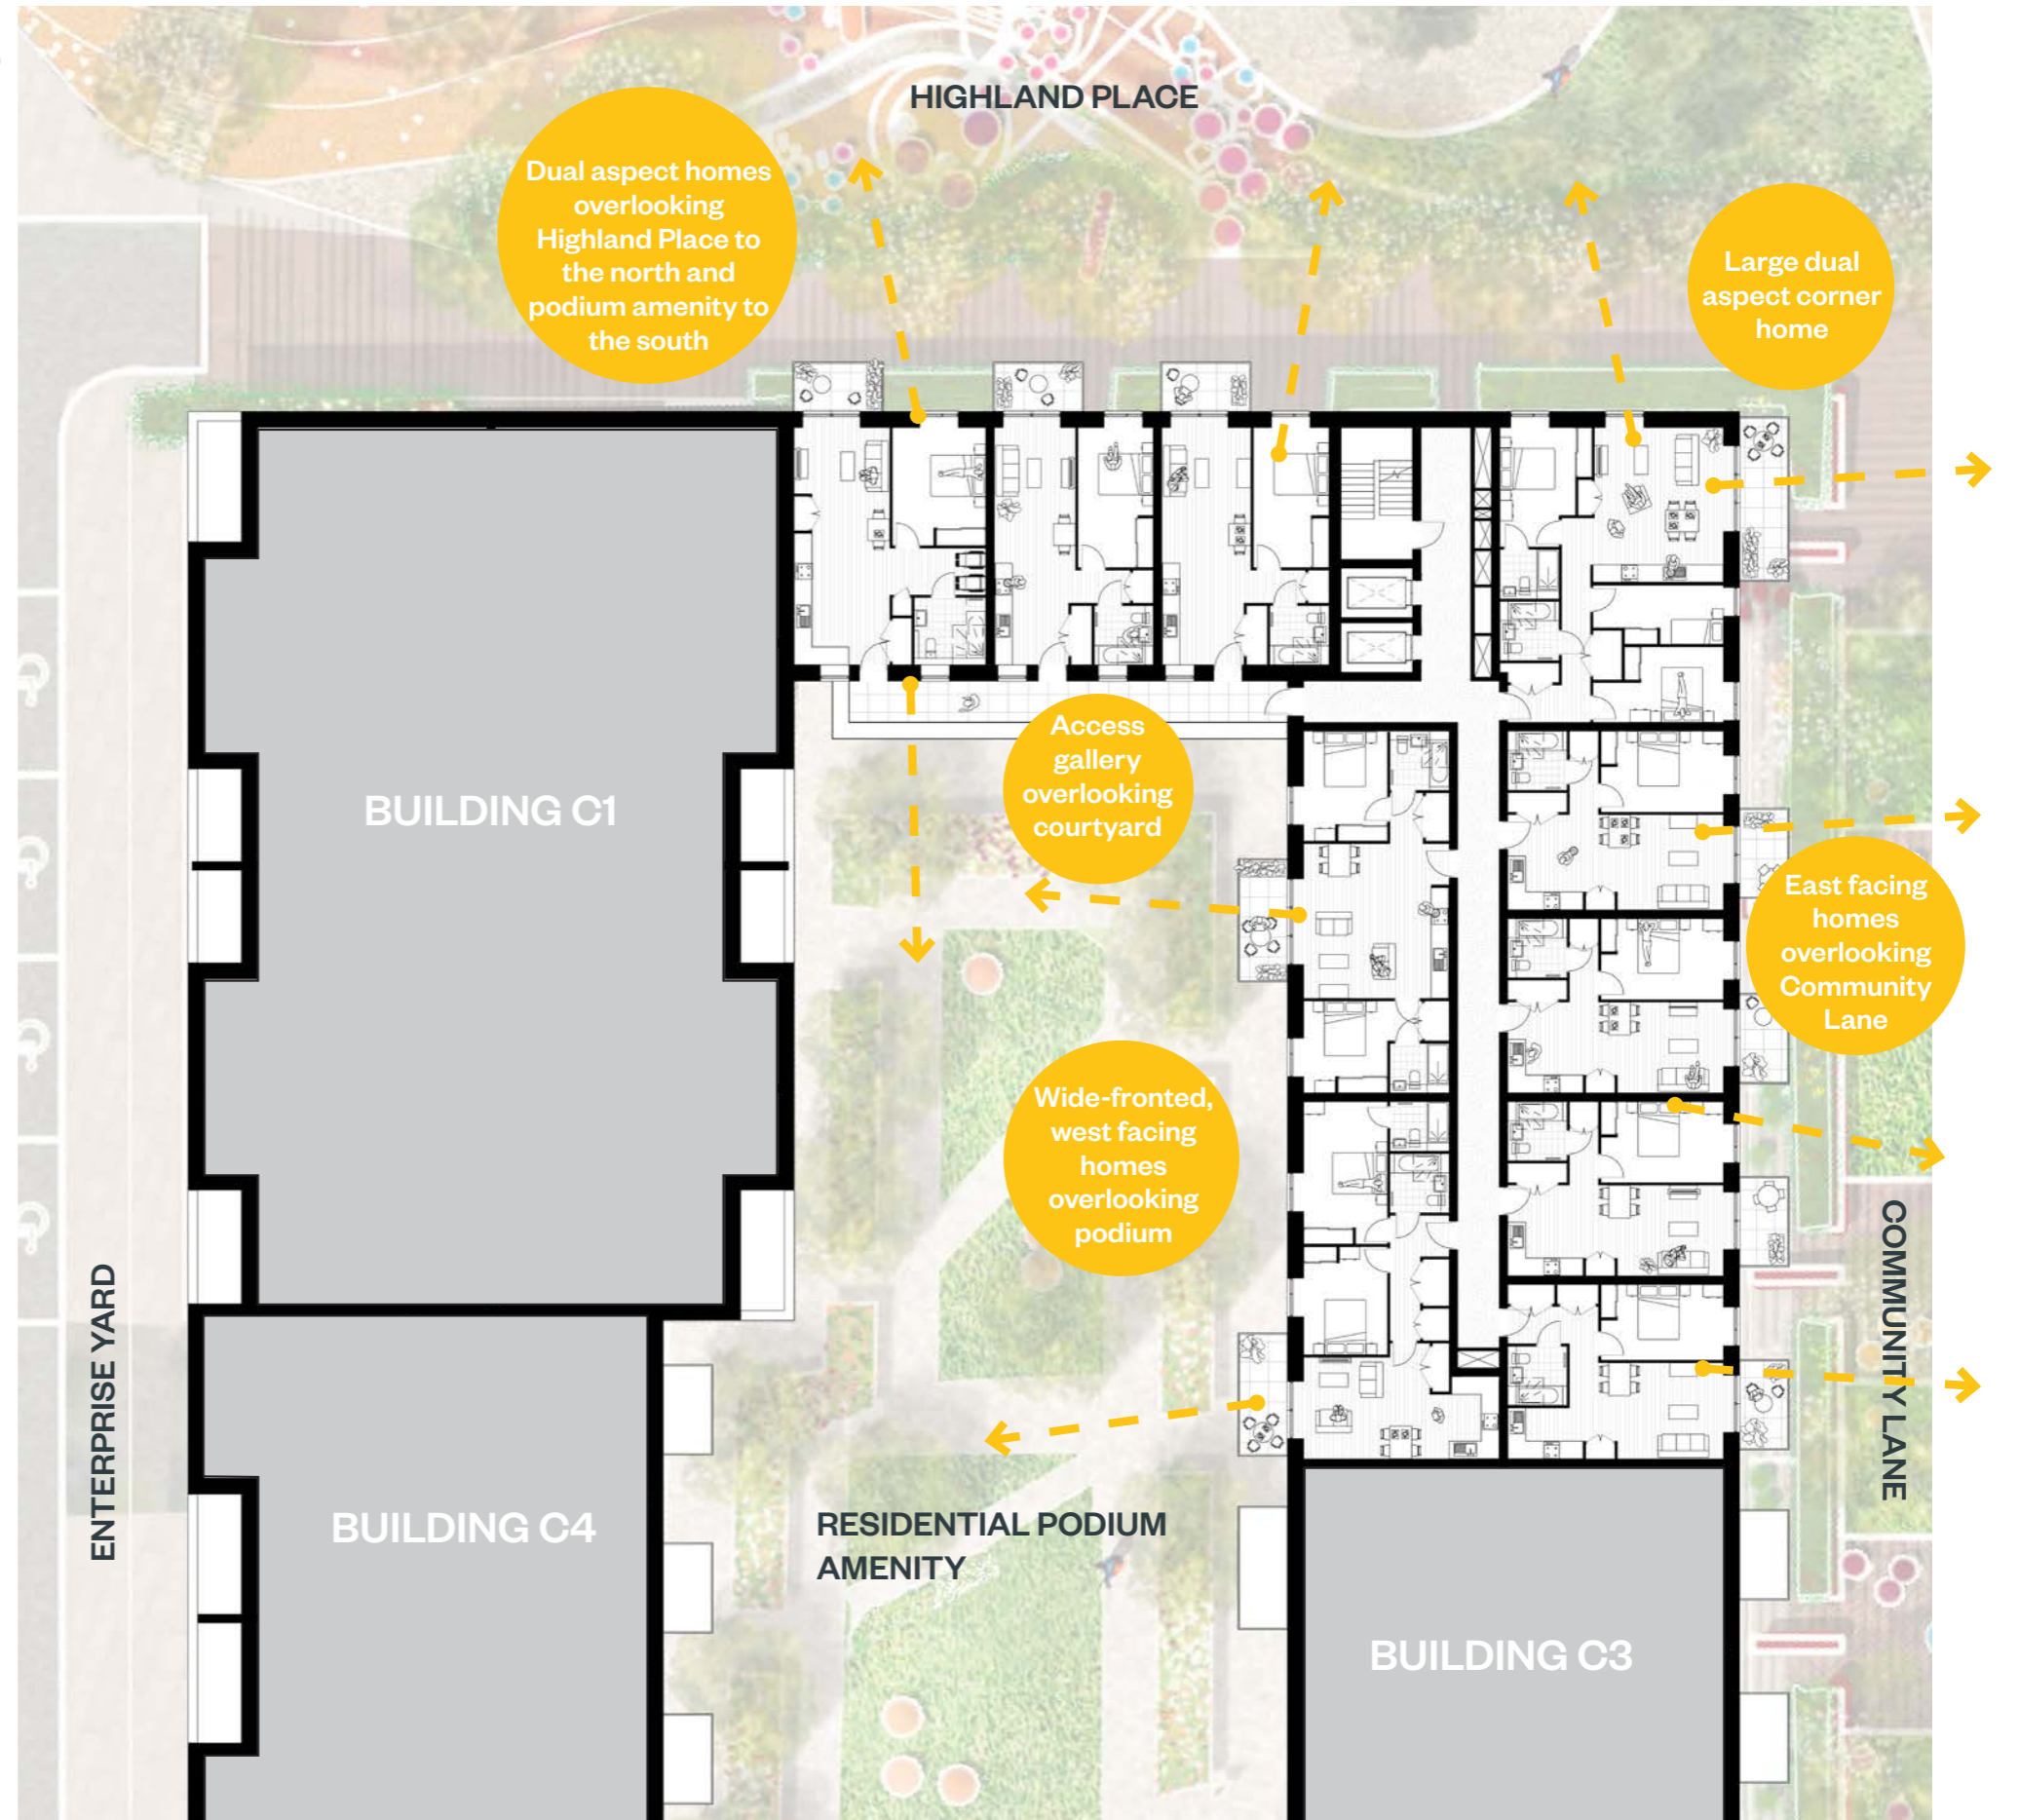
Typical upper floor plan of Building C2 illustrating building organisation and the internal plan of each home
